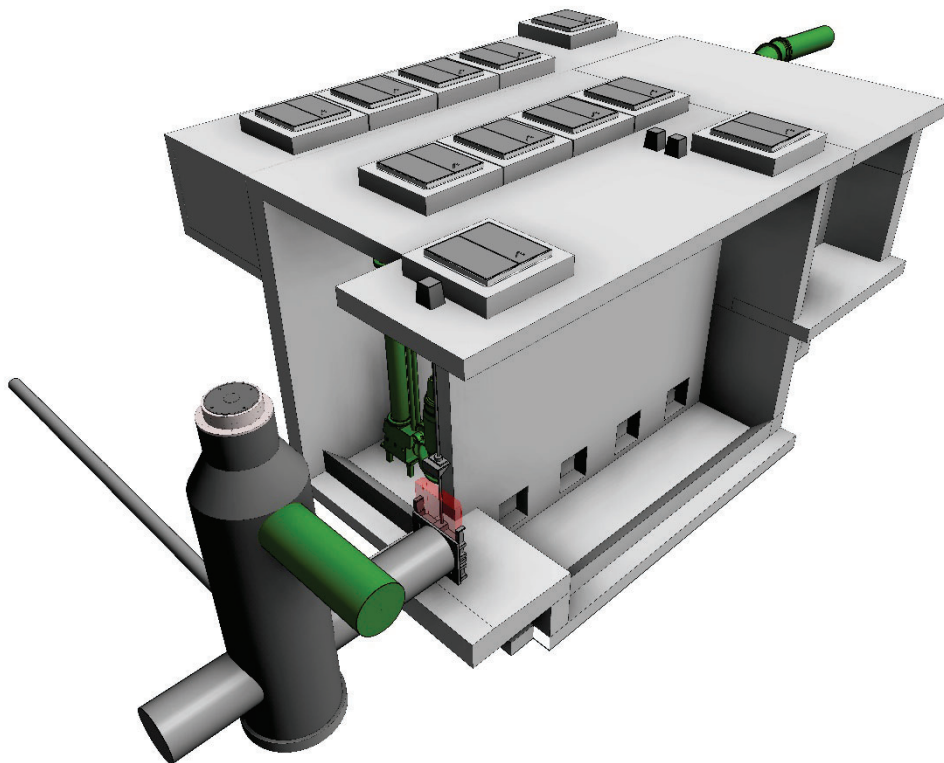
Proposed Opening on Existing Wet/Dry Dividing Wall to Convert the PS into a Wet Well
